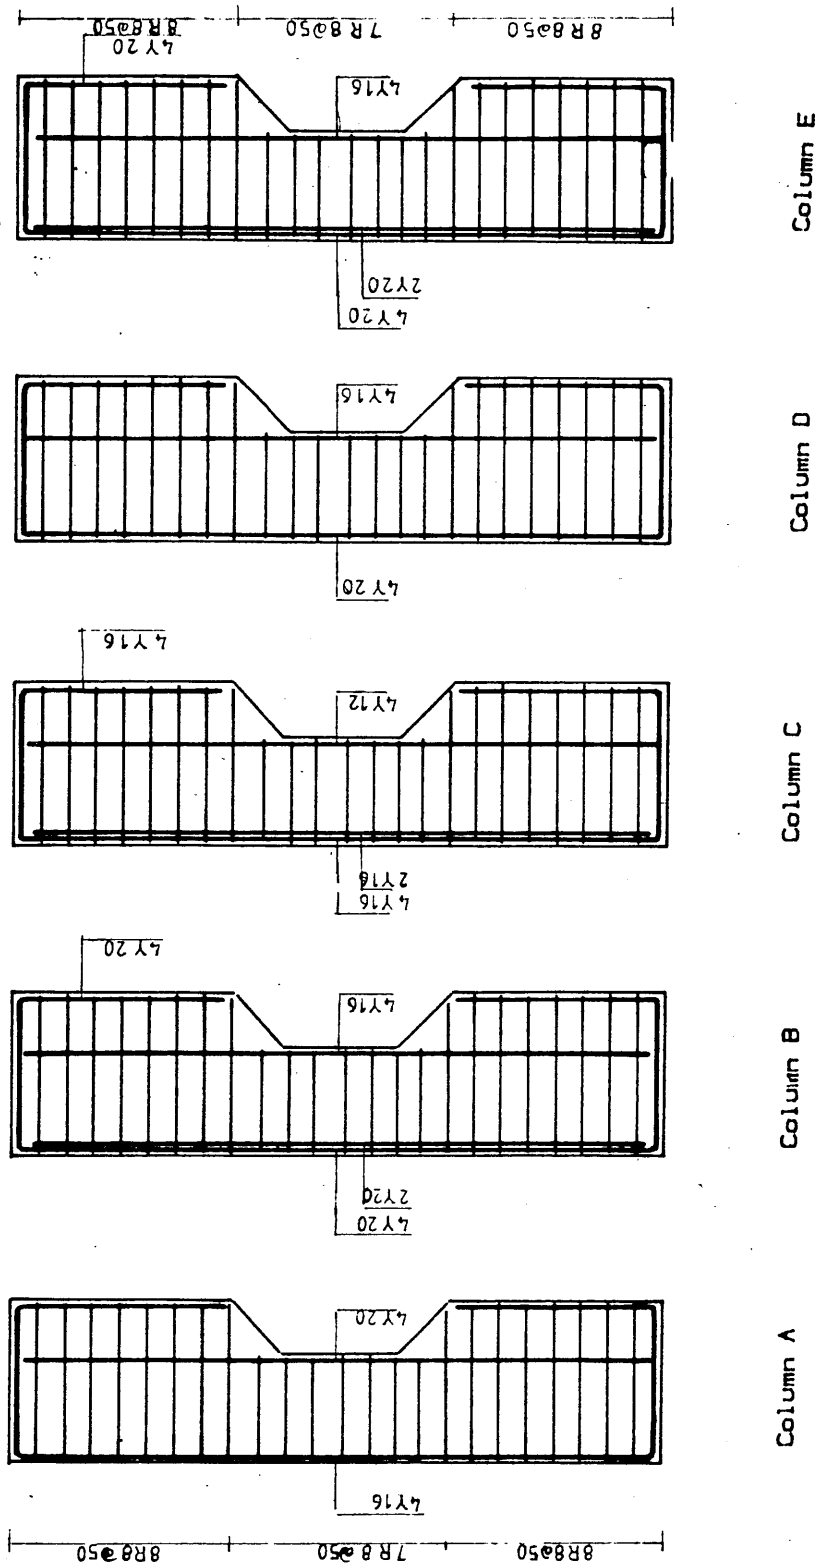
Details of reinforcement for the five reinforced PC columns.
